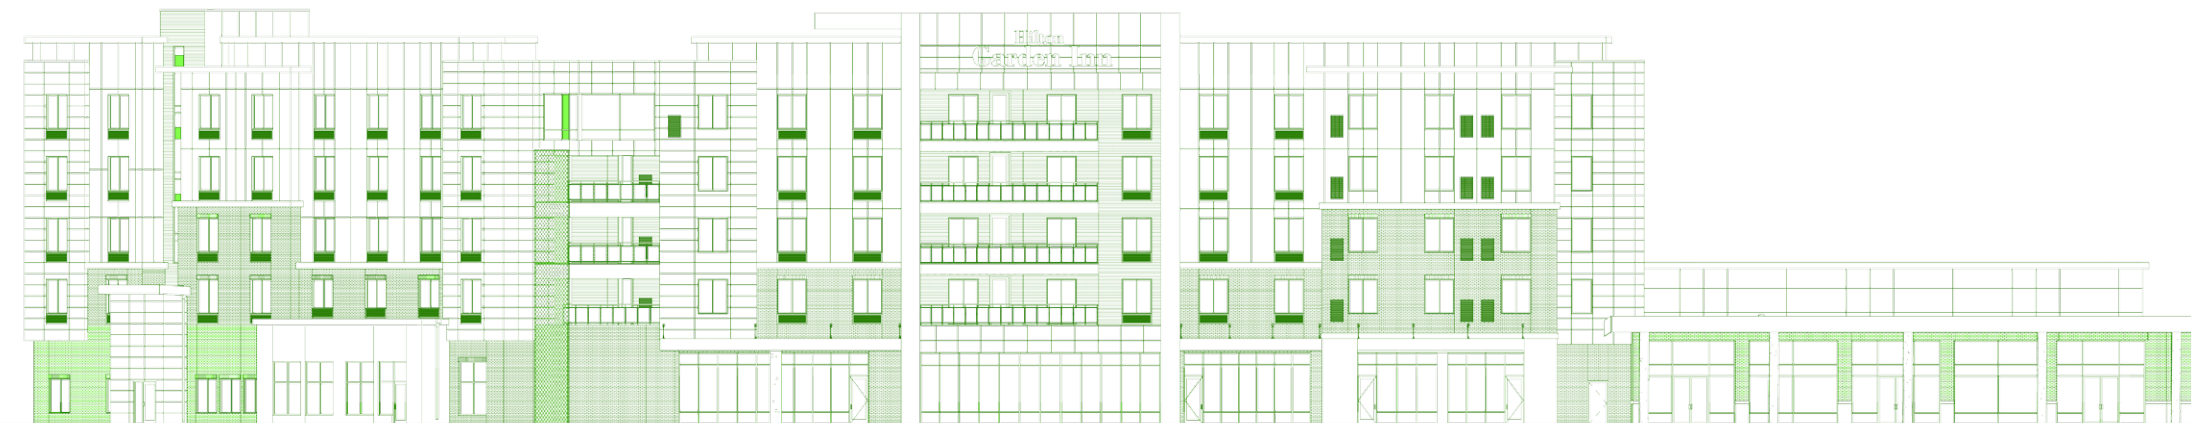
Hilton Garden Inn South West Elevation (VanDeWalle, 2012)
